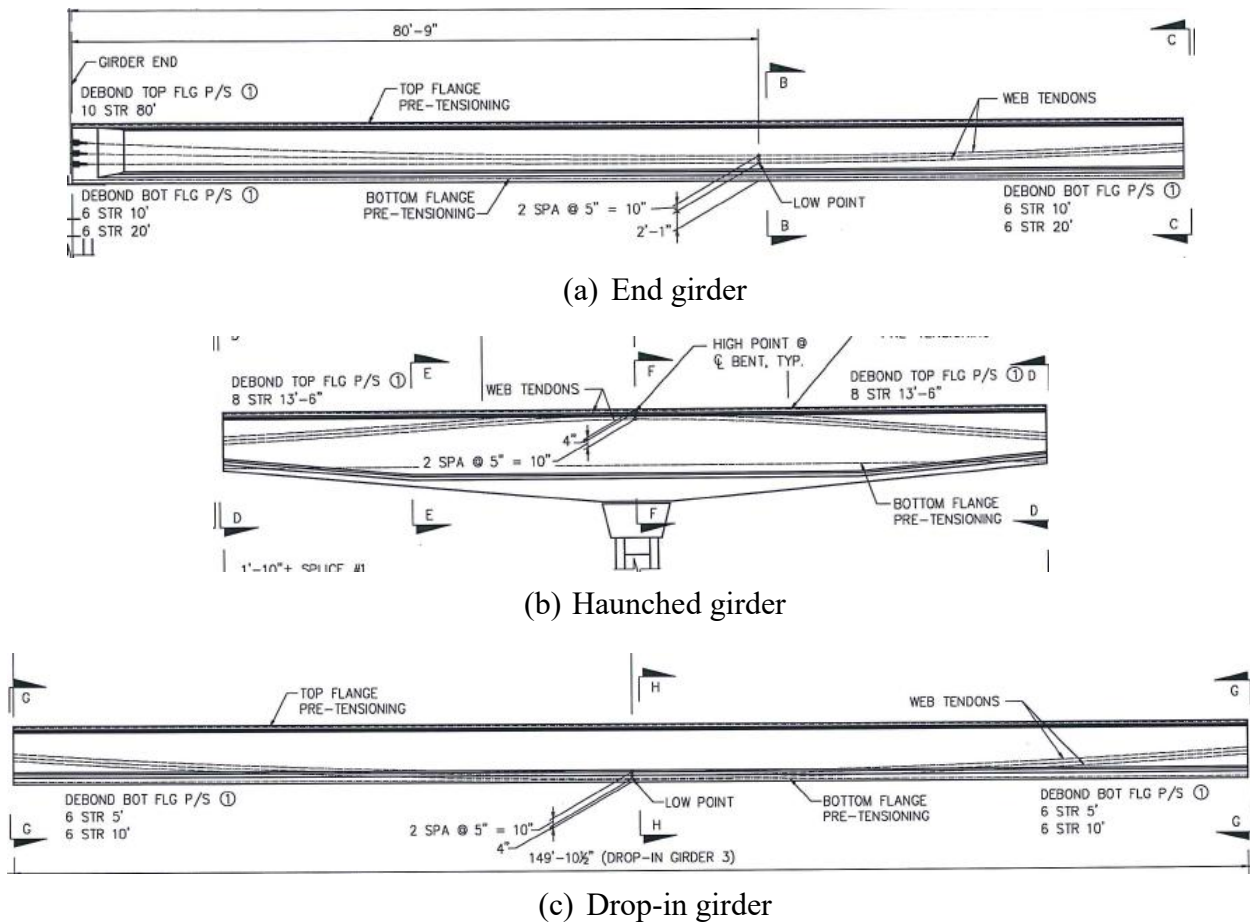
28 Round Rock Beamlines Elevation View Drawing (TxDOT)
